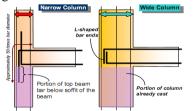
Anchorage of Beam Bars in Exterior Joints (Source: C.V.R.Murthy, 2003)
